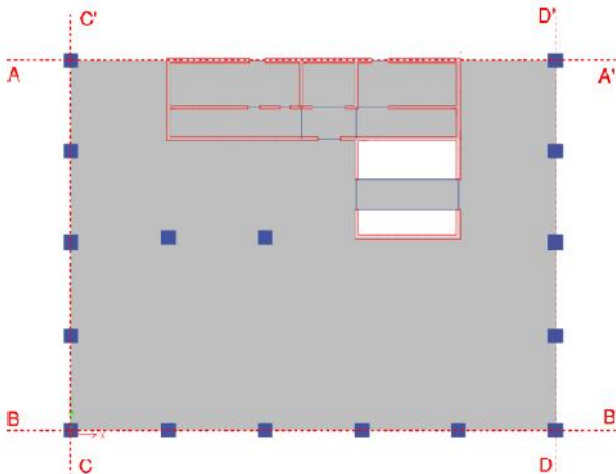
Typical Floor Plan Indicating Grid Location for Torsion Irregularity Check
